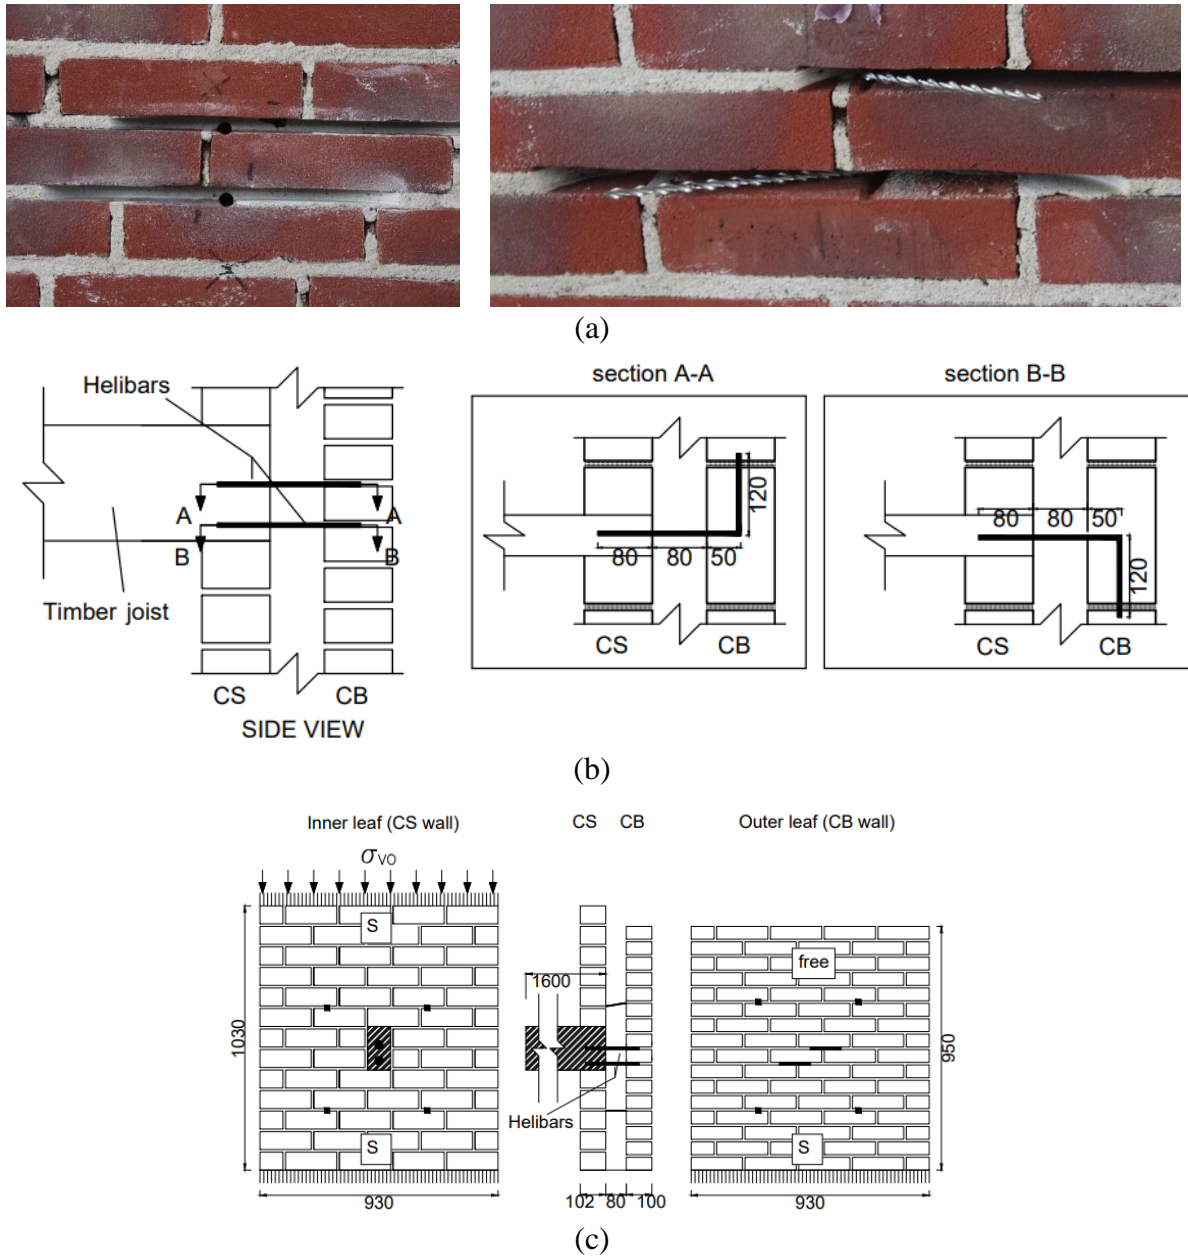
Details of the strengthened connections with helical bars: installing procedure for helical bars (a), schematic overview of helical bars (b), and test wall configuration for the strengthened connection (c) (dimensions are in mm).
